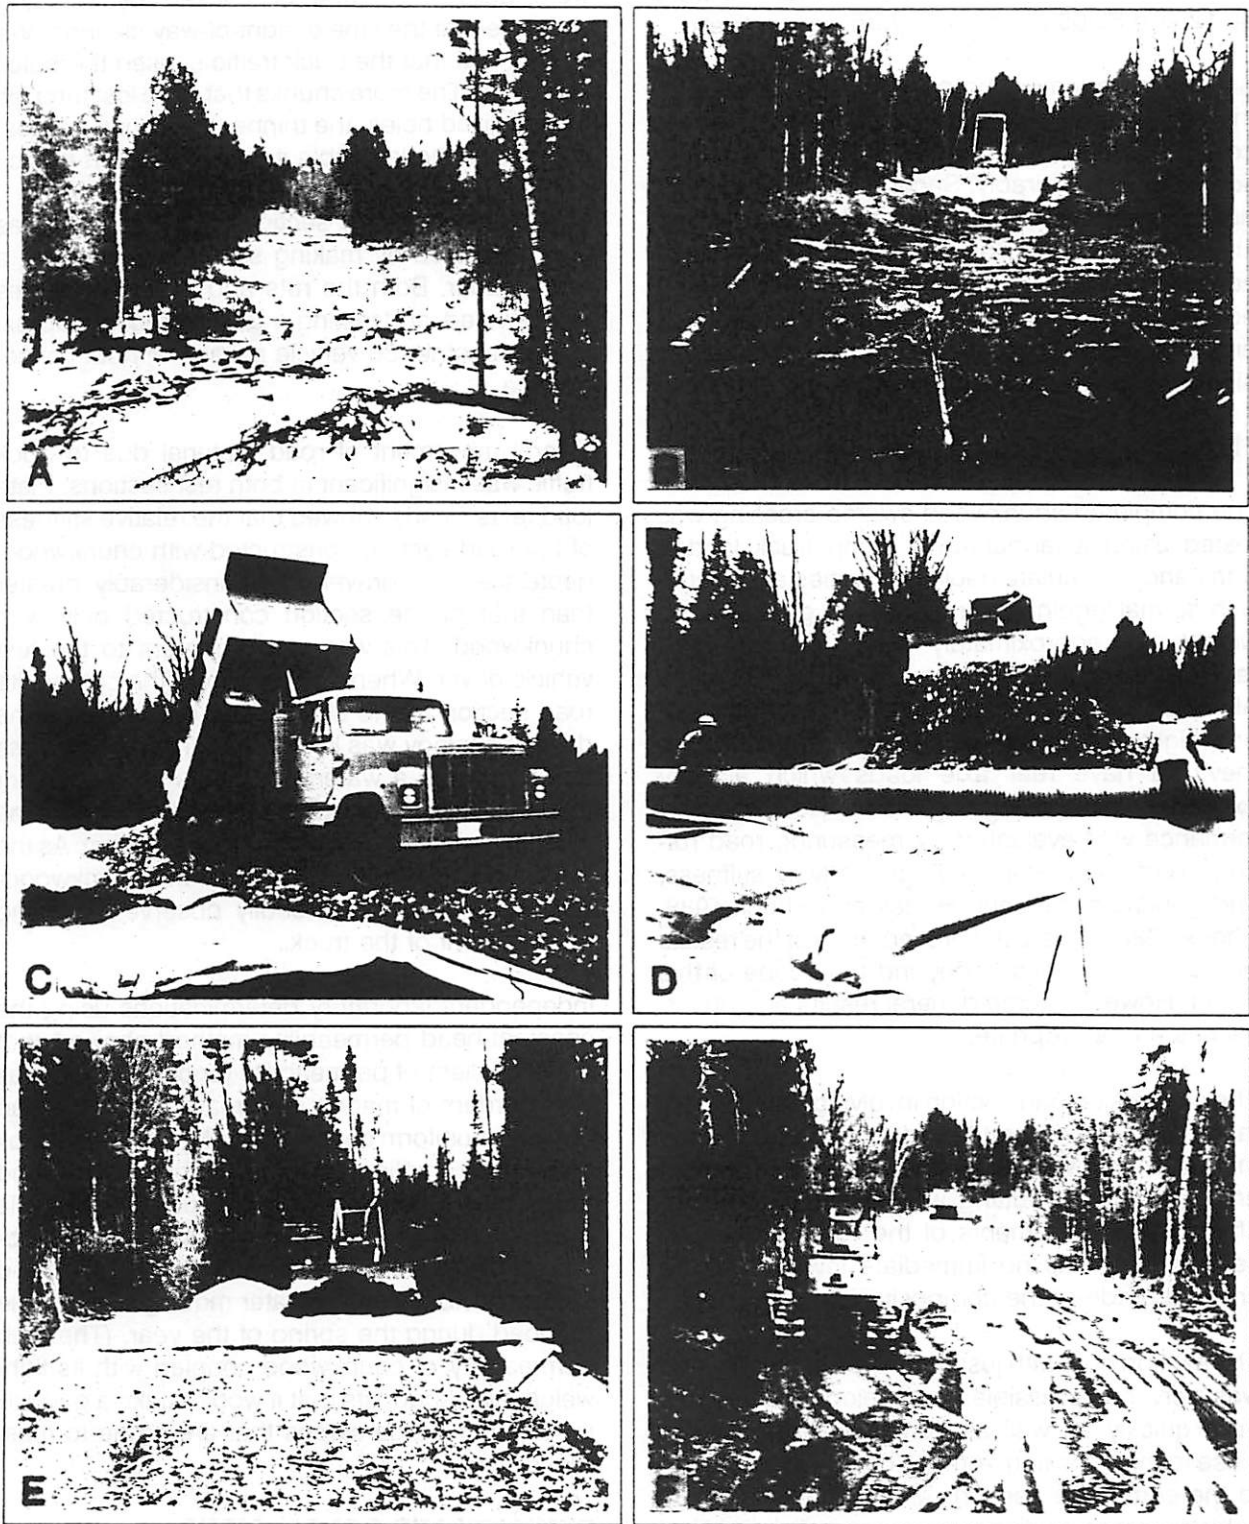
Swamp crossing at FR 481 (Hayward site): A. Right-of-way clearing; B. Ungrubbed swamp in foreground; C. Dumping of chunkwood onto geotextile fabric; D. Installation of culvert; E. Application of geotextile fabric and gravel over chunkwood base; F. Nearing completion of swamp crossing.
